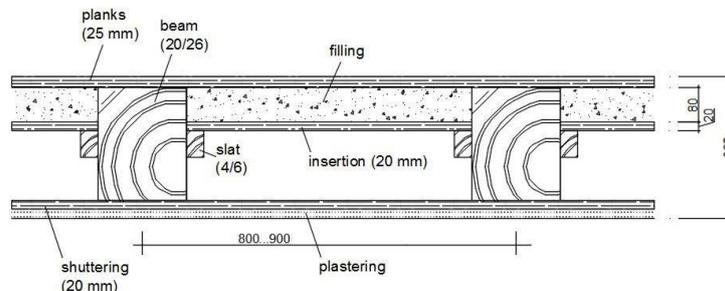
Historic Timber Beam Ceiling – Example for construction [21]
